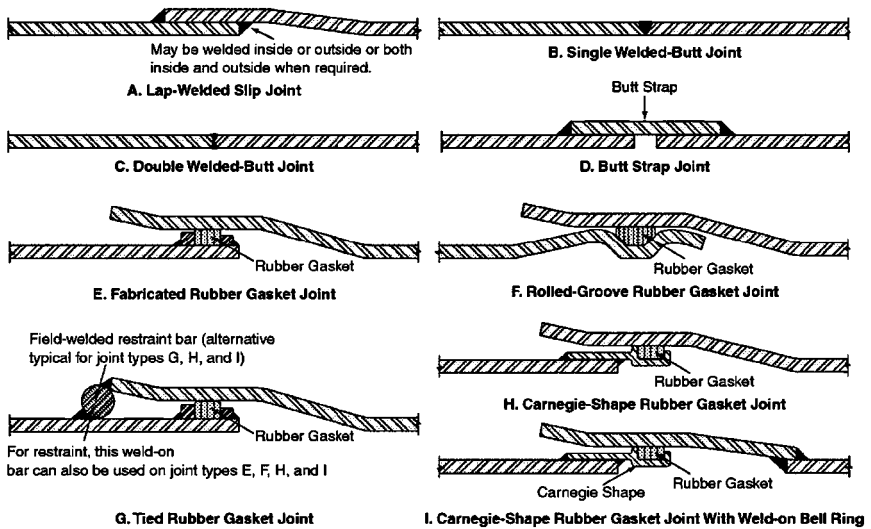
Welded and Rubber-Gasketed Field Joints
